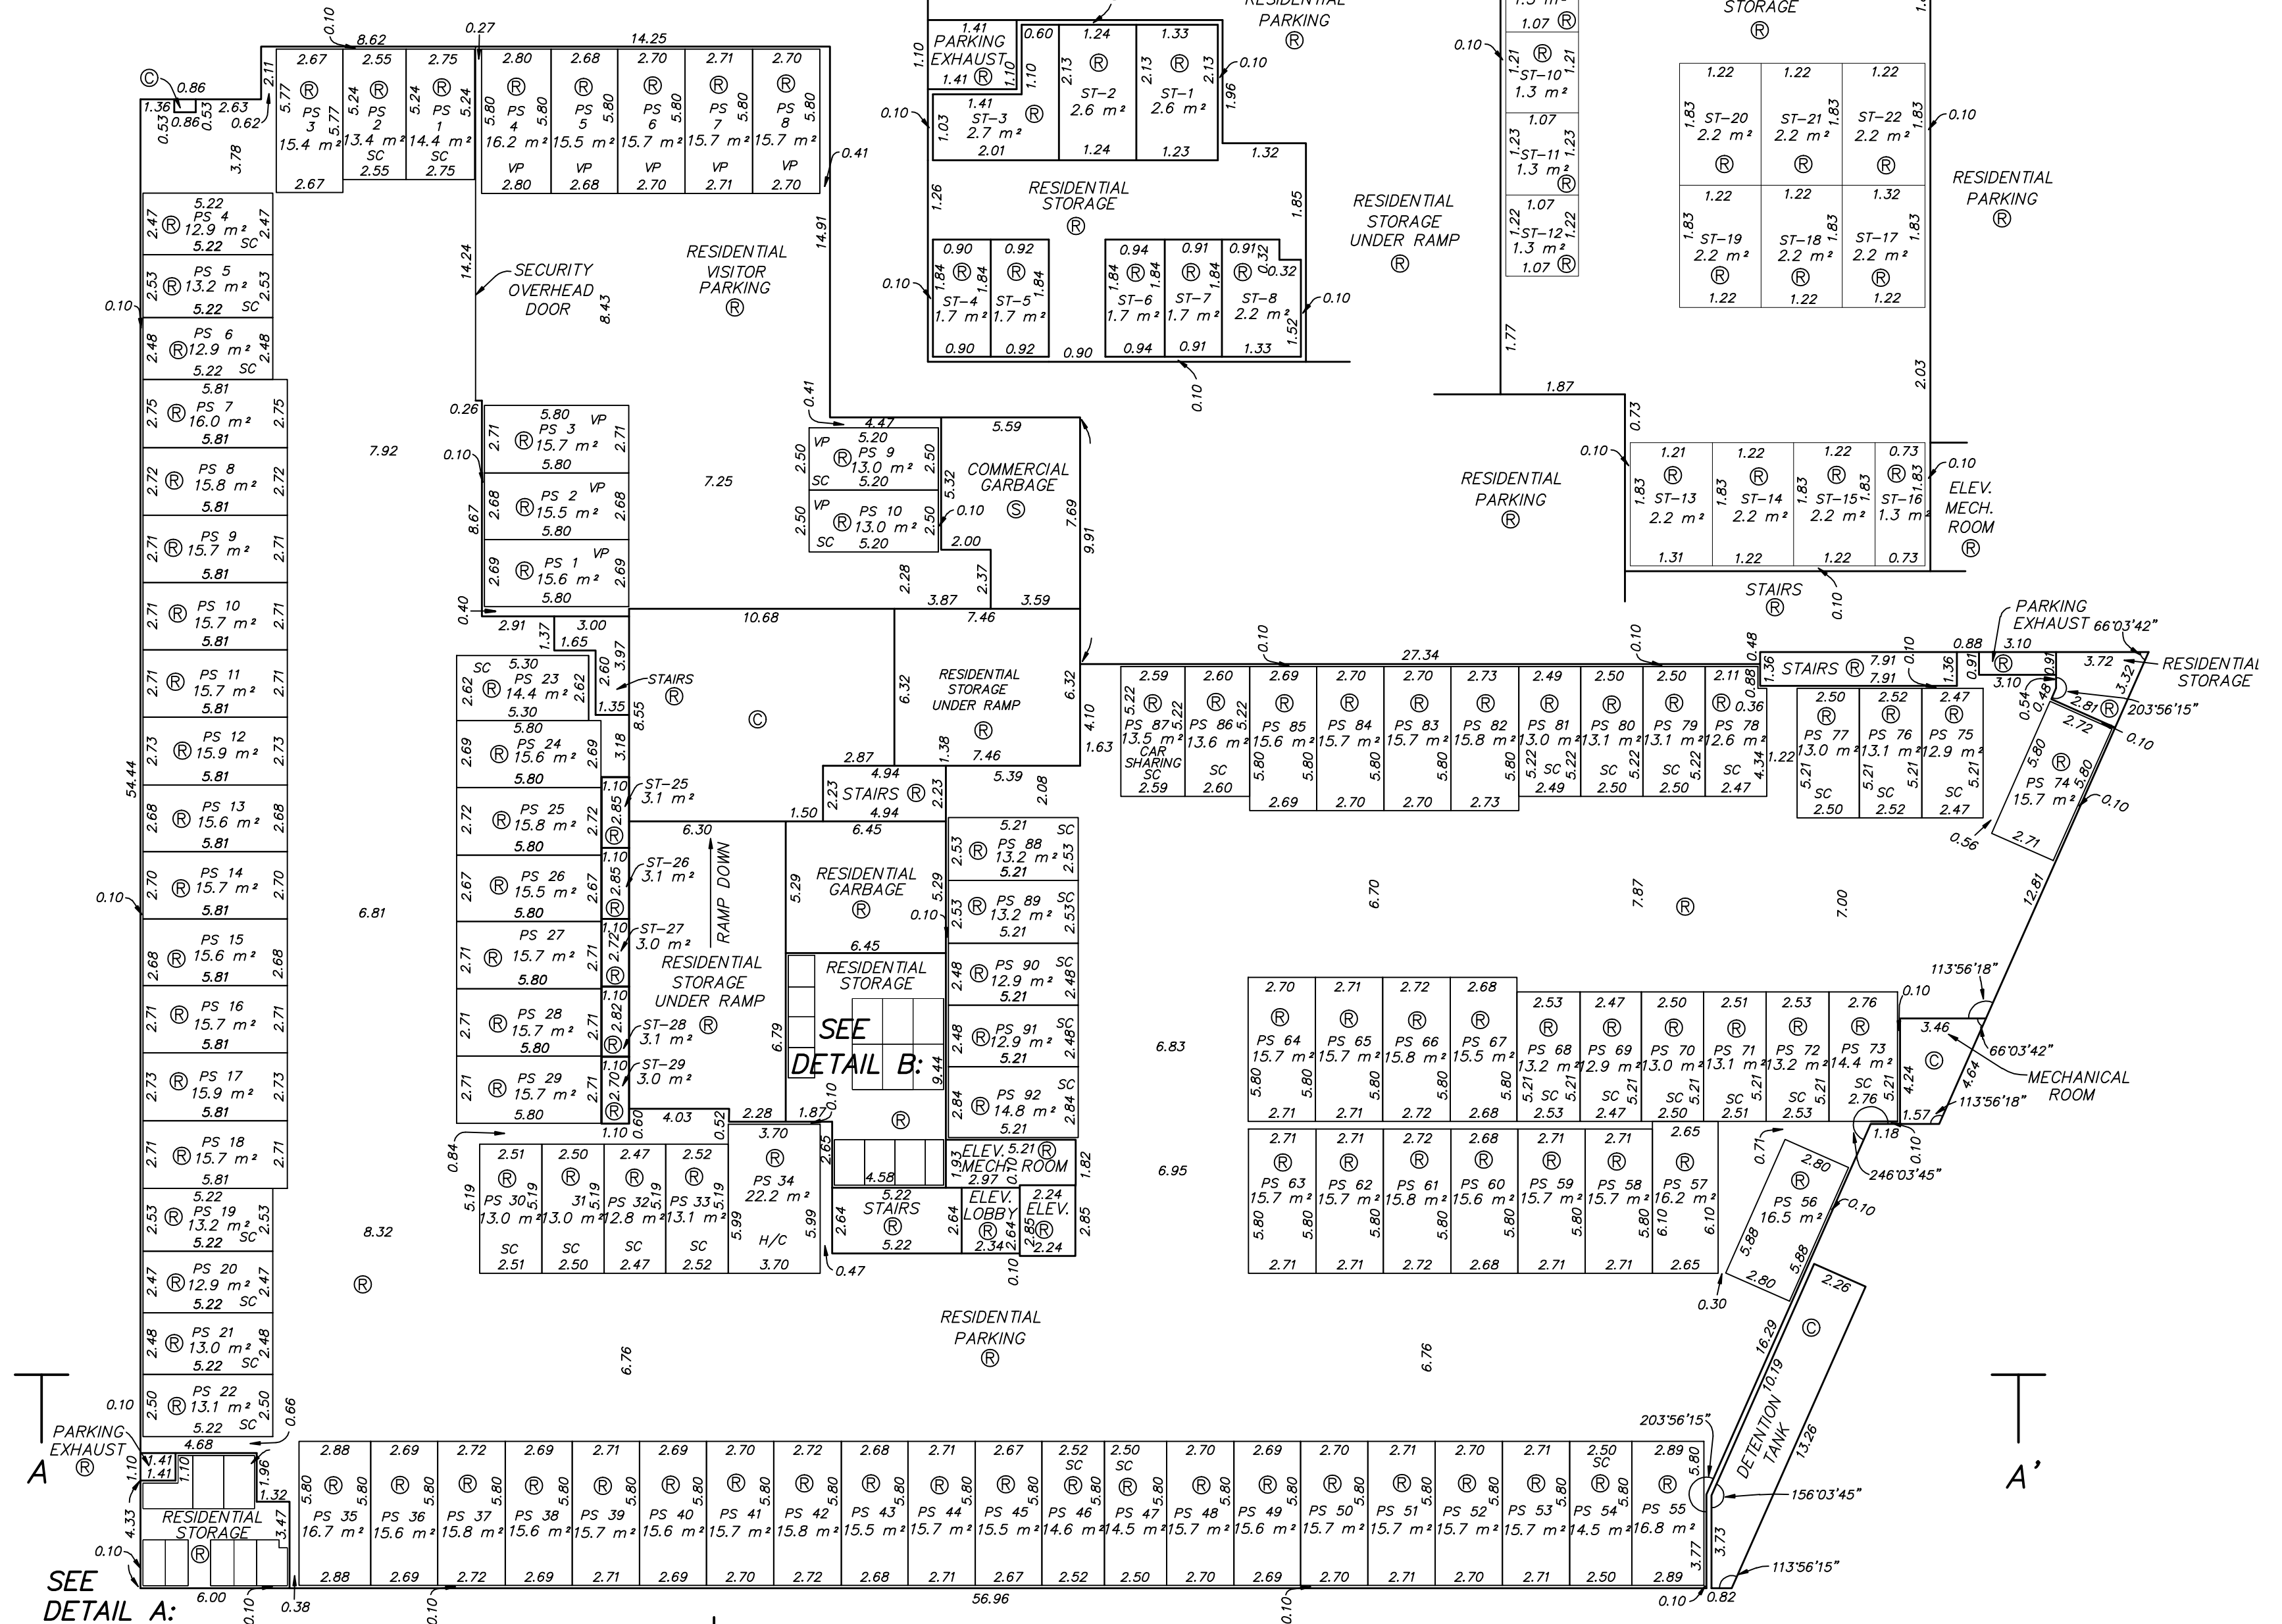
is a detailed site plan of a 1.0-acre residential development. The plan shows a central 'RESIDENTIAL STORAGE' area (1.26 acres) surrounded by 'PARKING EXHAUST' (1.41 acres) and 'RESIDENTIAL PARKING' (1.33 acres). The plan includes eight storage units (ST-1 to ST-8) and eight parking spaces (P-1 to P-8). Dimensions and areas are provided for each unit and space. The plan is oriented with North at the top.
